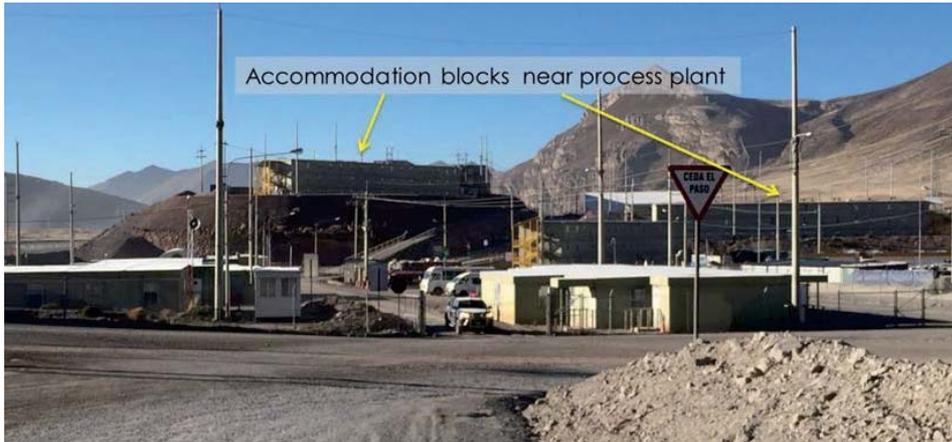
Accommodation blocks and camp adjacent to process plant facility 2016-July-27
